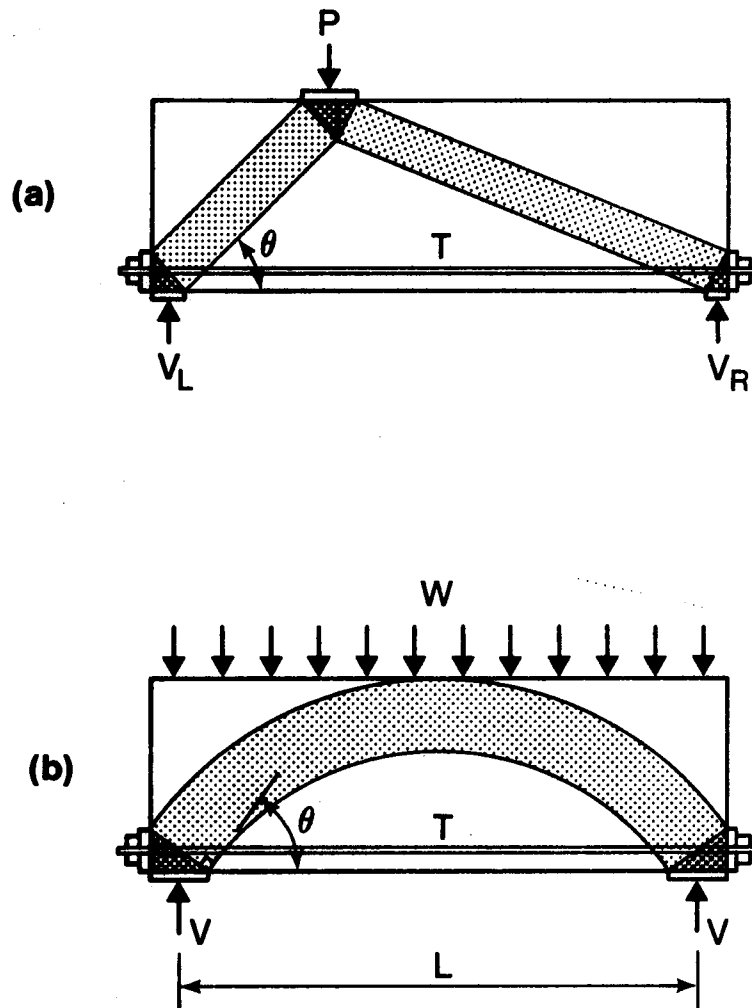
Plastic Trusses for Beams Without Web Reinforcement
